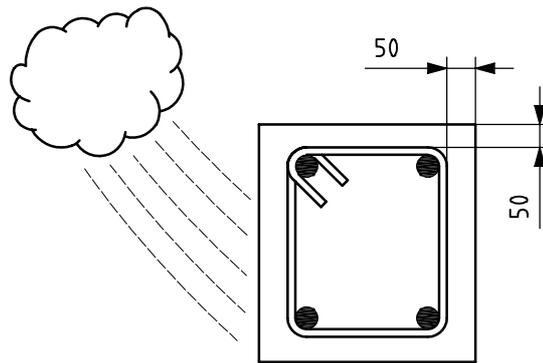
All types of reinforcement of elements exposed to weather — Minimum concrete cover 50 mm
